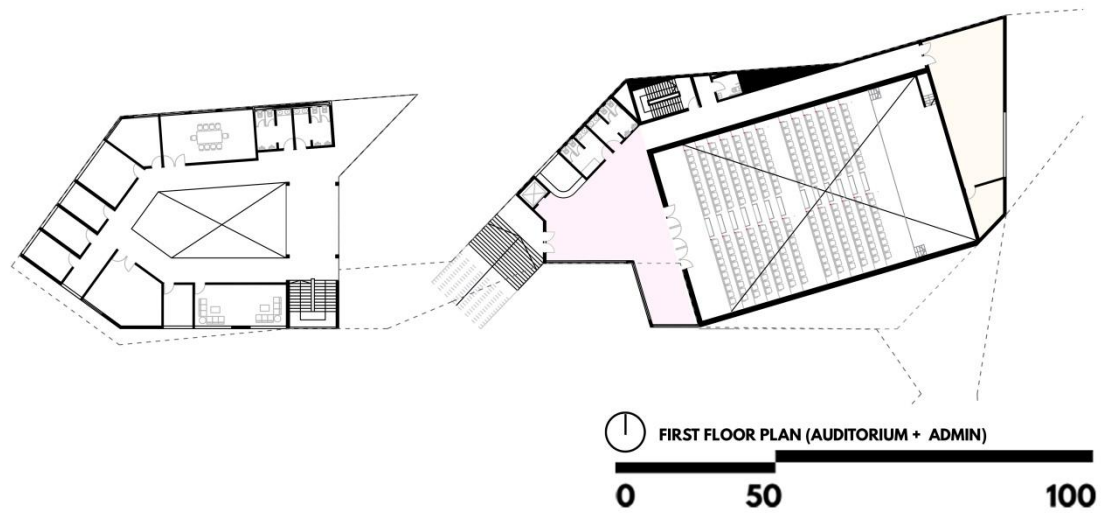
Auditorium and admin facility first floor plan (Author ,2020)
